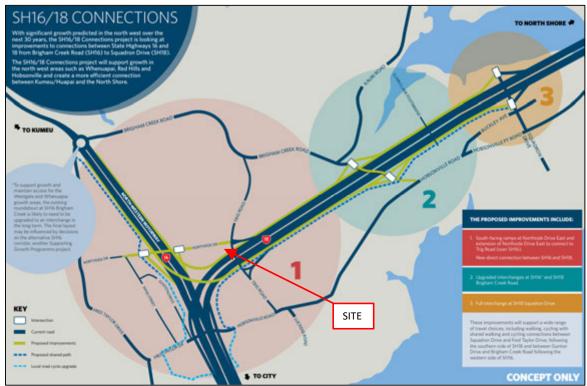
is Waka Kotahi's concept of the future Northside Drive connection to Trig Road, and it includes a bridge over SH16 together with south facing SH16 ramps.
